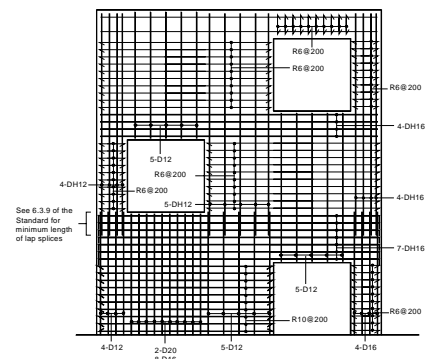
Required reinforcement in a concrete masonry wall having irregular openings (Voon and Ingham 2004).
